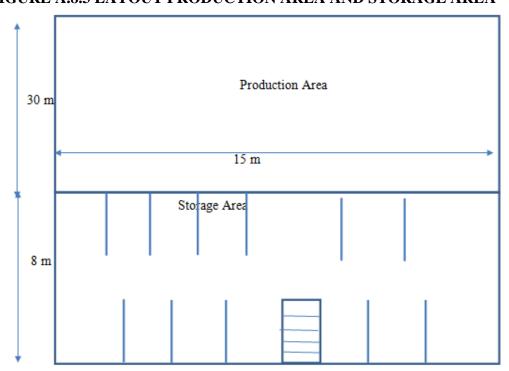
LAYOUT PRODUCTION AREA AND STORAGE AREA²²
